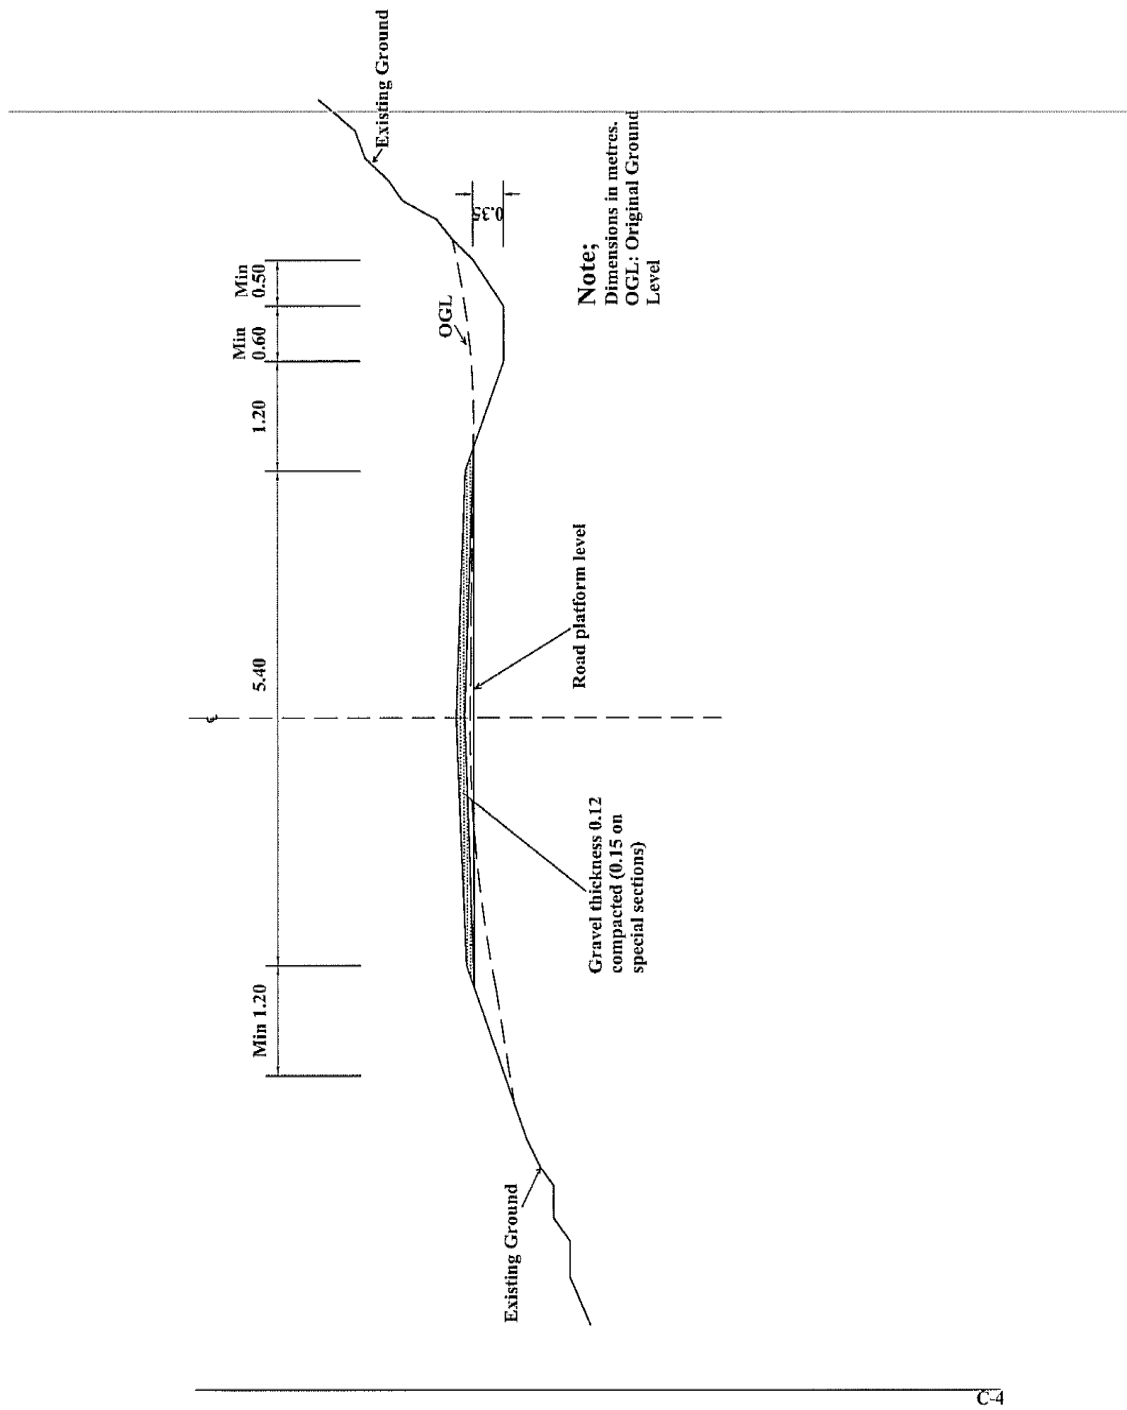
STANDARD CROSS- SECTION (SUPERELEVATION)
